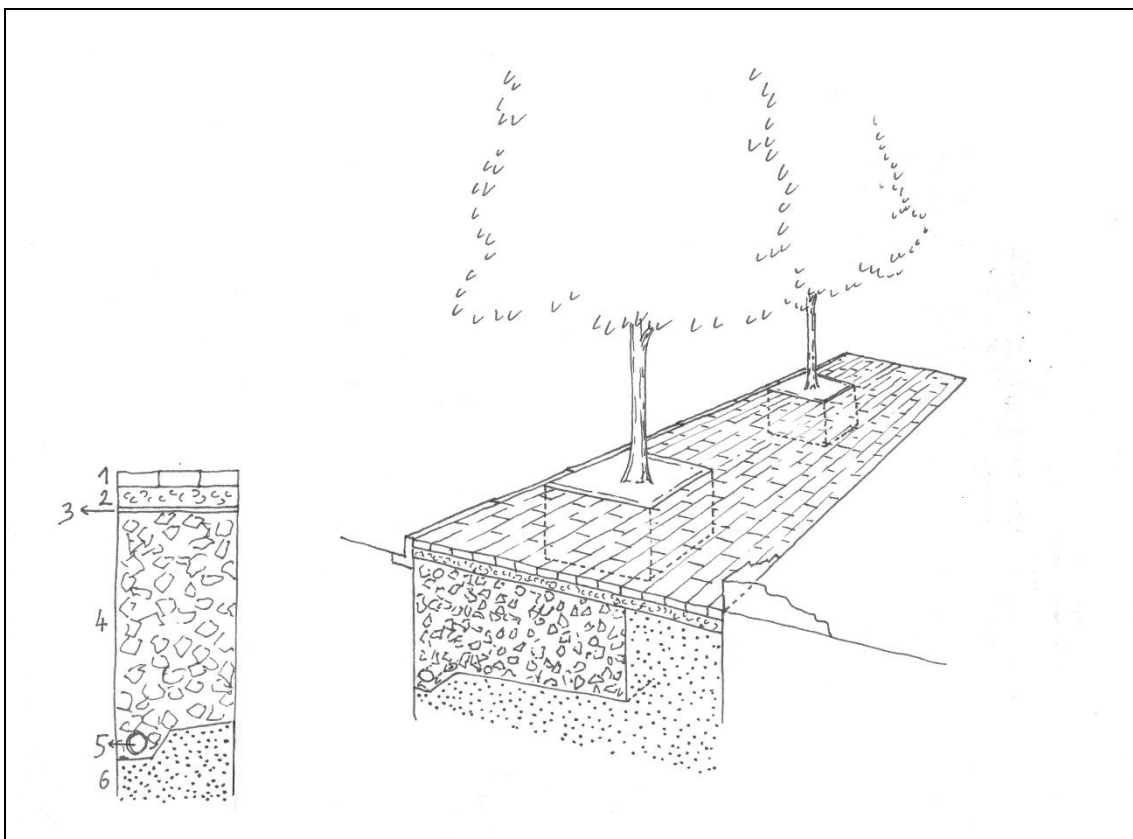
Example of use of structural substrate in street avenue (5.11): 1 – pavement, 2 – gravel bed, 3 – geotextile, 4 – structural substrate, 5 – drainage, 6 – natural earth.
